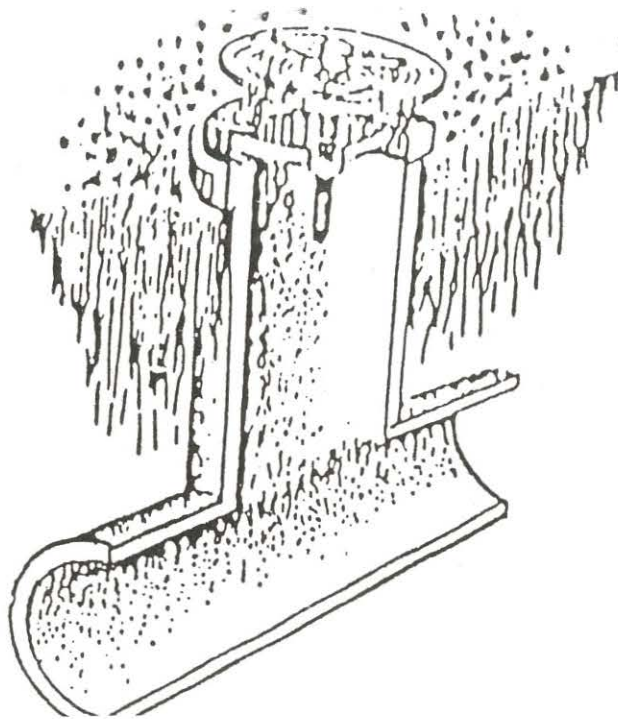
Section of an alfalfa valve mounted on a pipe.
